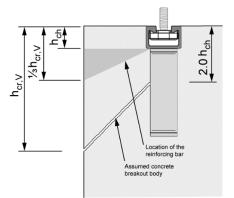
RECOMMENDED AREA FOR THE LOCATION OF THE EDGE REINFORCEMENT BAR (Reinforcing bar location within recommended area shall account for all factors, (for example, concrete cover, bend radius, etc.) as required by NZS 3101
